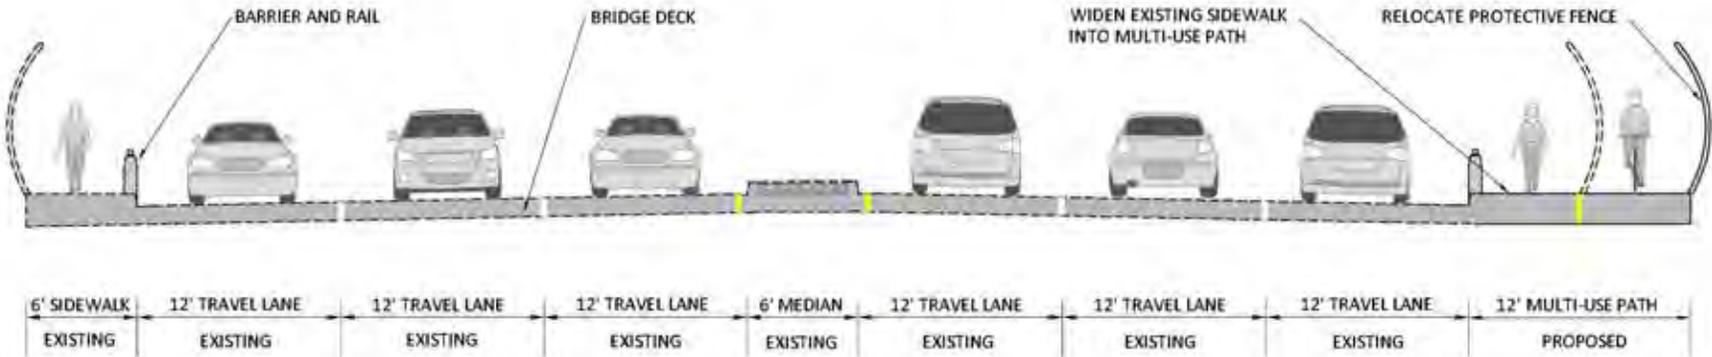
Cross Section with Widened Trail at New York Avenue NE Bridge over Amtrak Railroad Tracks, Looking East.
